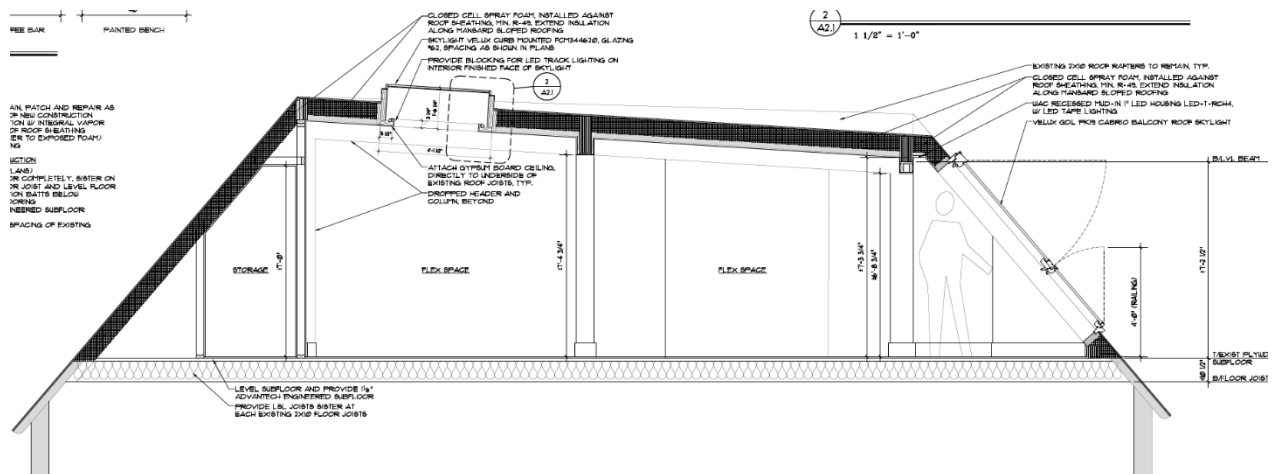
Subject Property – Proposed attic floor section of architectural plans
